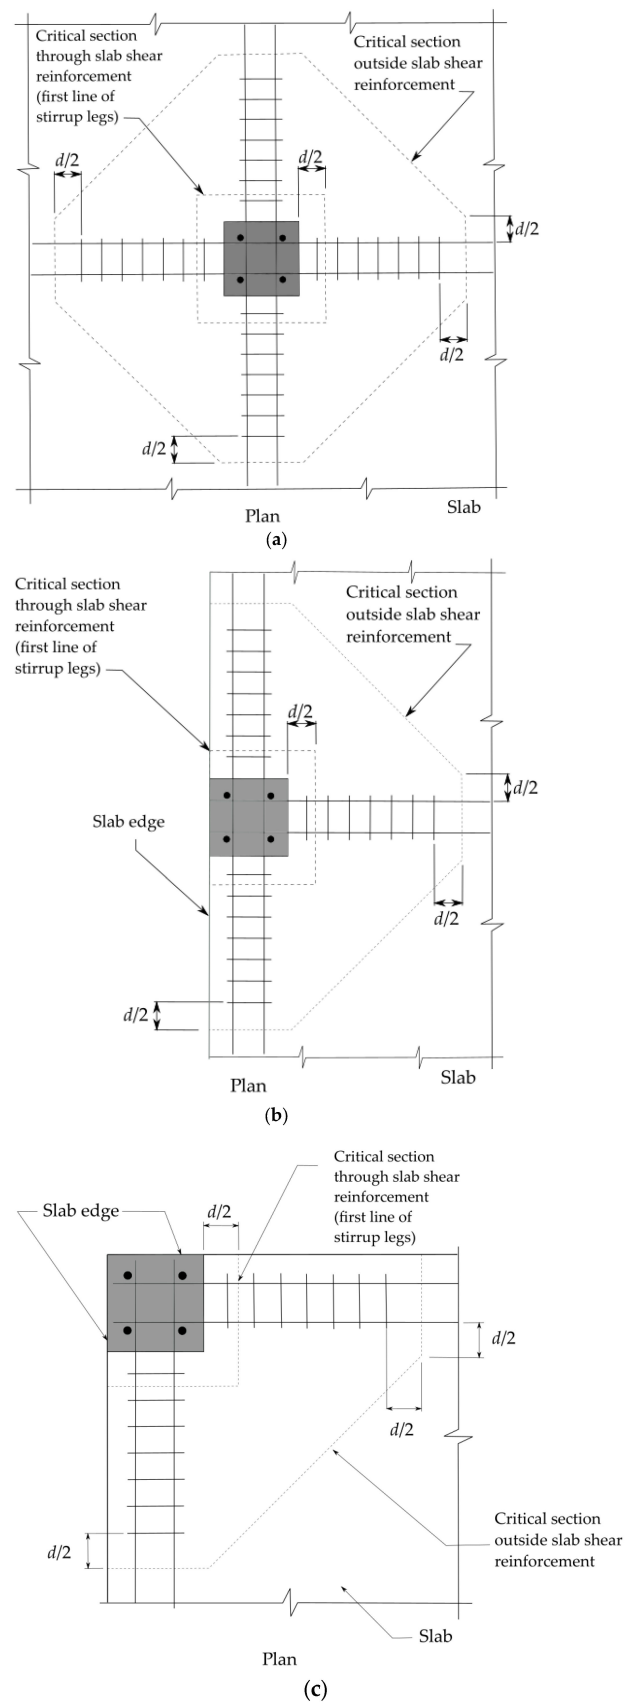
Critical perimeter for a shear-reinforced interior, edge and corner slab–column connection, modified from Ref. [7]: (a) interior slab–column connection; (b) edge slab–column connection; (c) corner slab–column connection.
